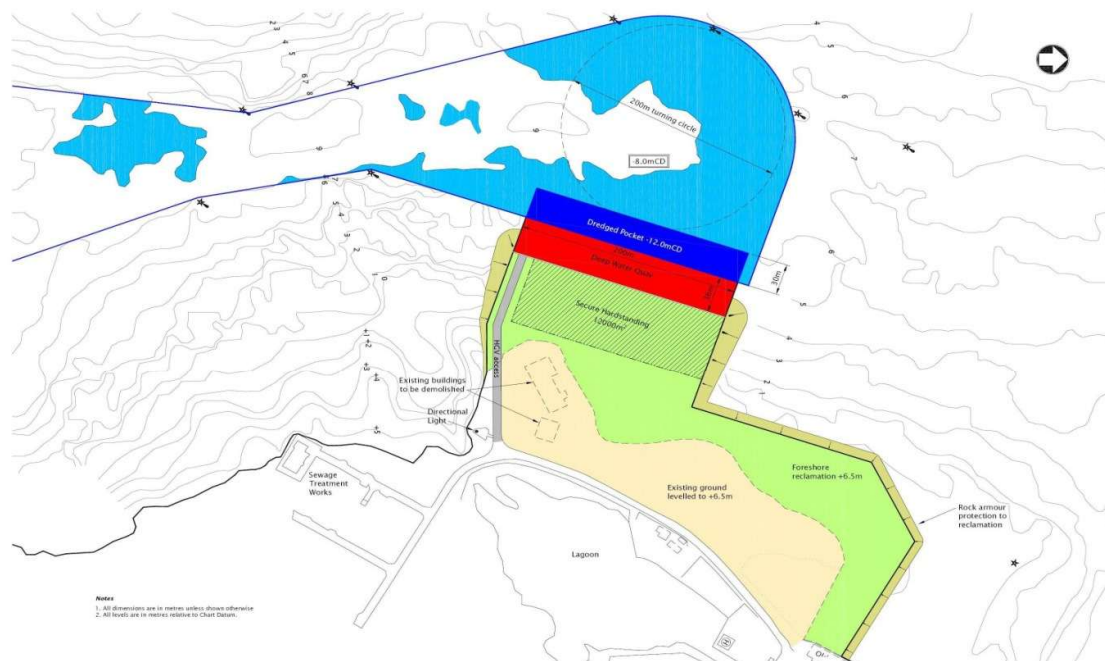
Proposed Layout of deep-water Quay at Rosaveel.
